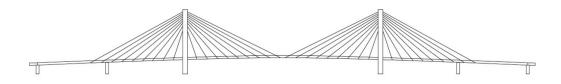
Schematic of Cable-Stayed Bridge Option – Two-Towers
